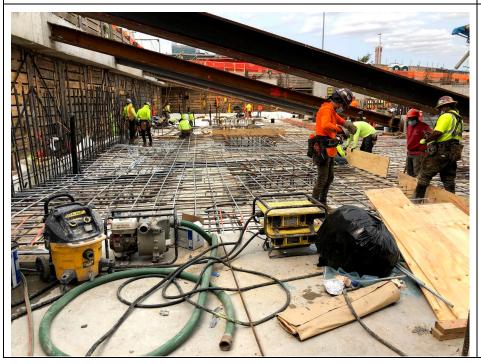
View of New Leaf placing wood forms around rebar in preparation of a concrete pour that will take place on 9/17/2020.
